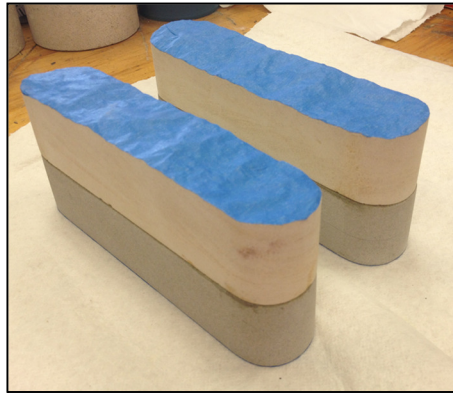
Tape protecting fracture and bottom surface from silicon.
